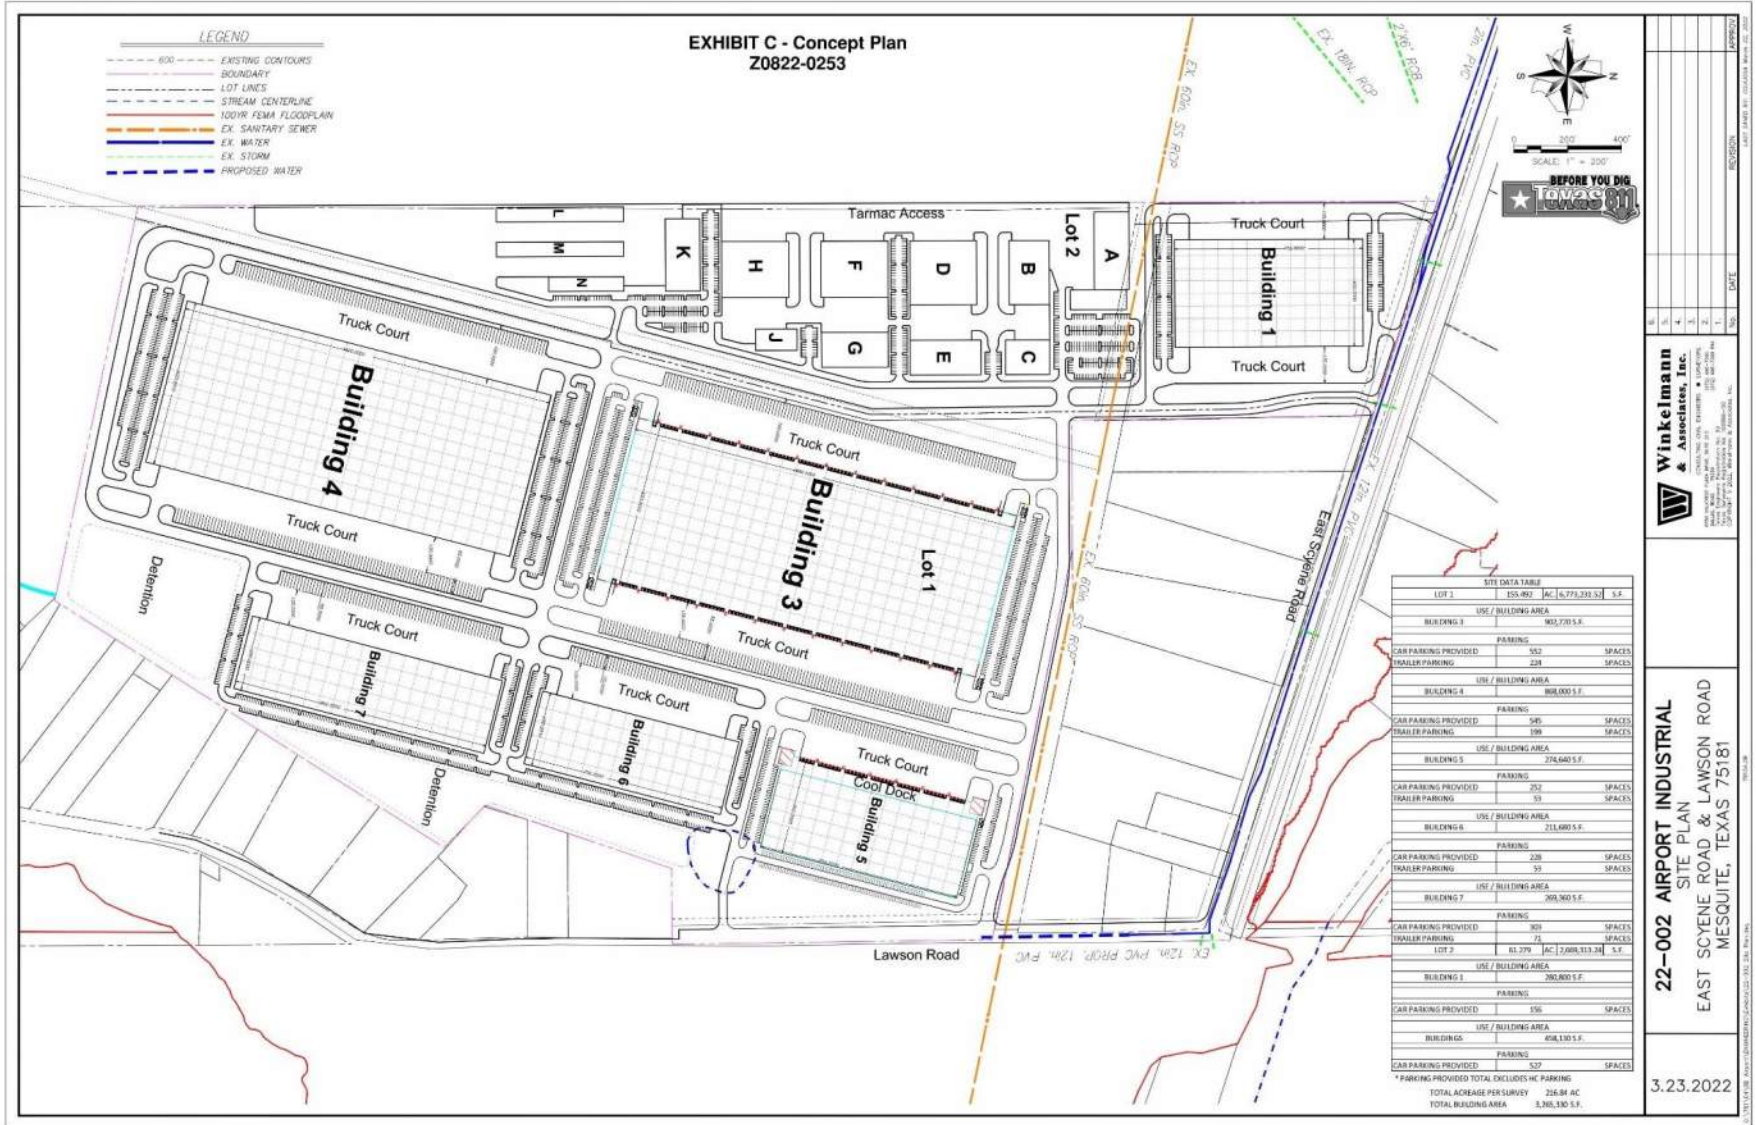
EXHIBIT C – FILE NO. Z0822-0253 - CONCEPT PLAN
